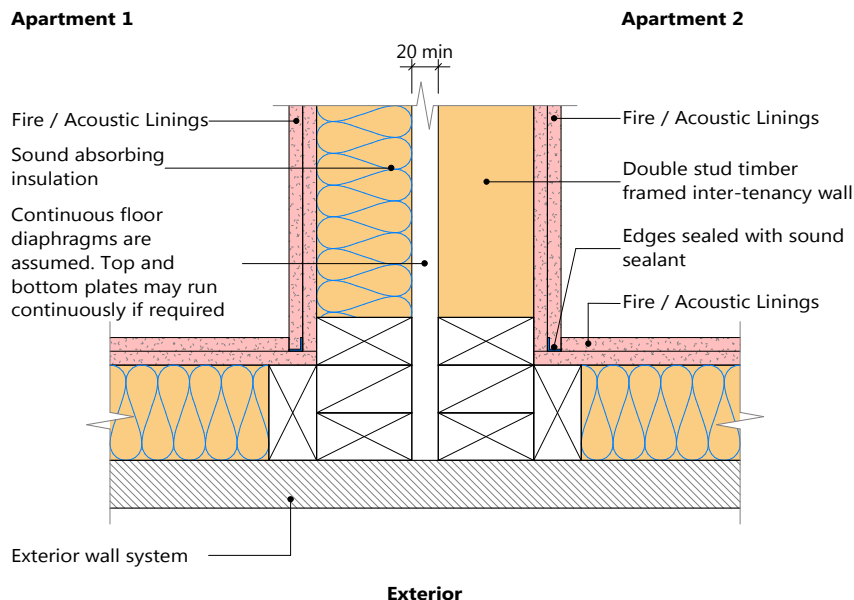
Conceptual details for intertenancy wall / exterior wall junction (plan view)
